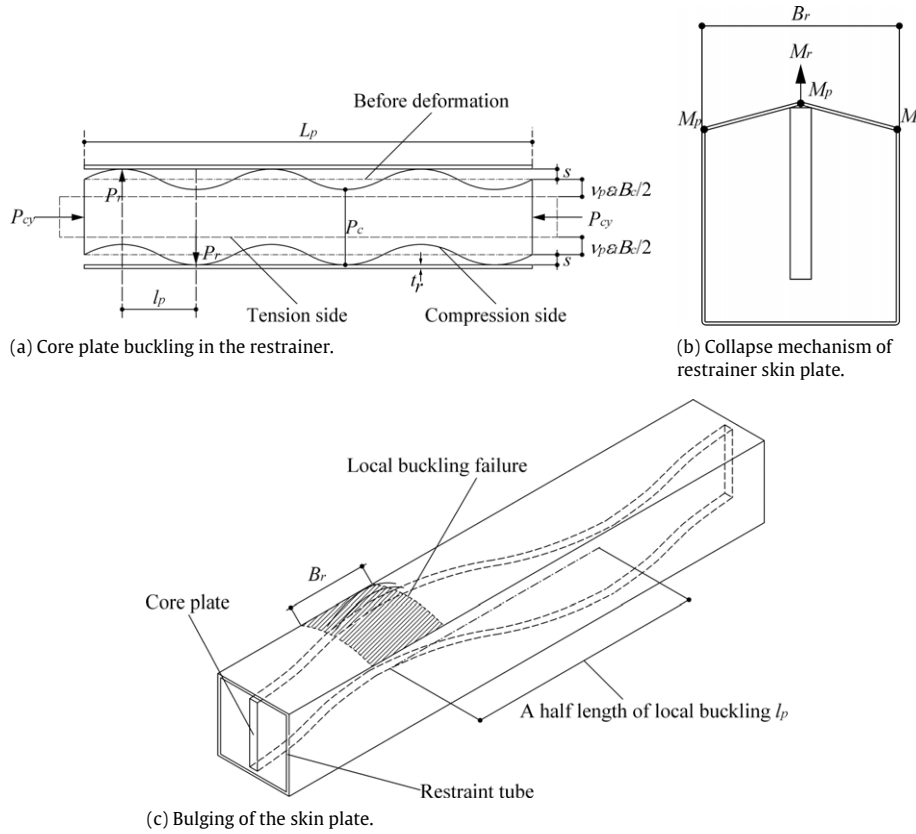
Collapse model of restrainer wall at local buckling failure.
